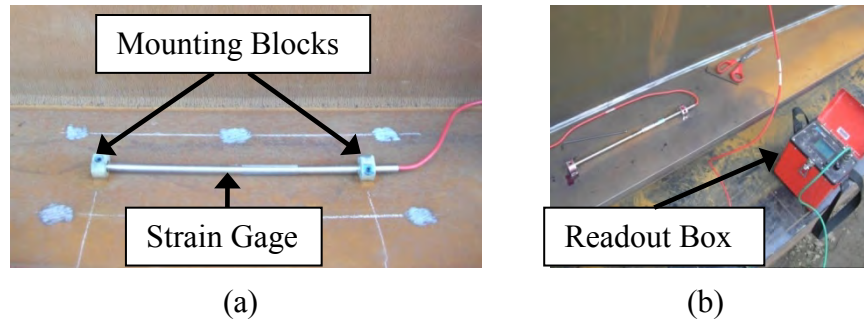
Girder Strain Gage Installation: (a) Girder strain gage and (b) Gage and readout box to ensure proper signal from gage
